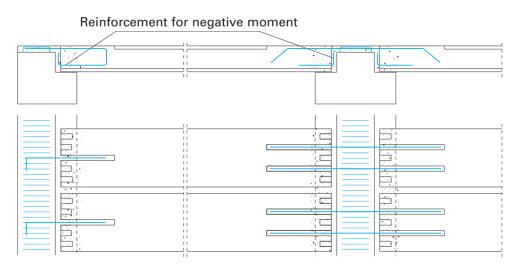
Typical connection between wall and floor for buildings higher than 10 storeys
